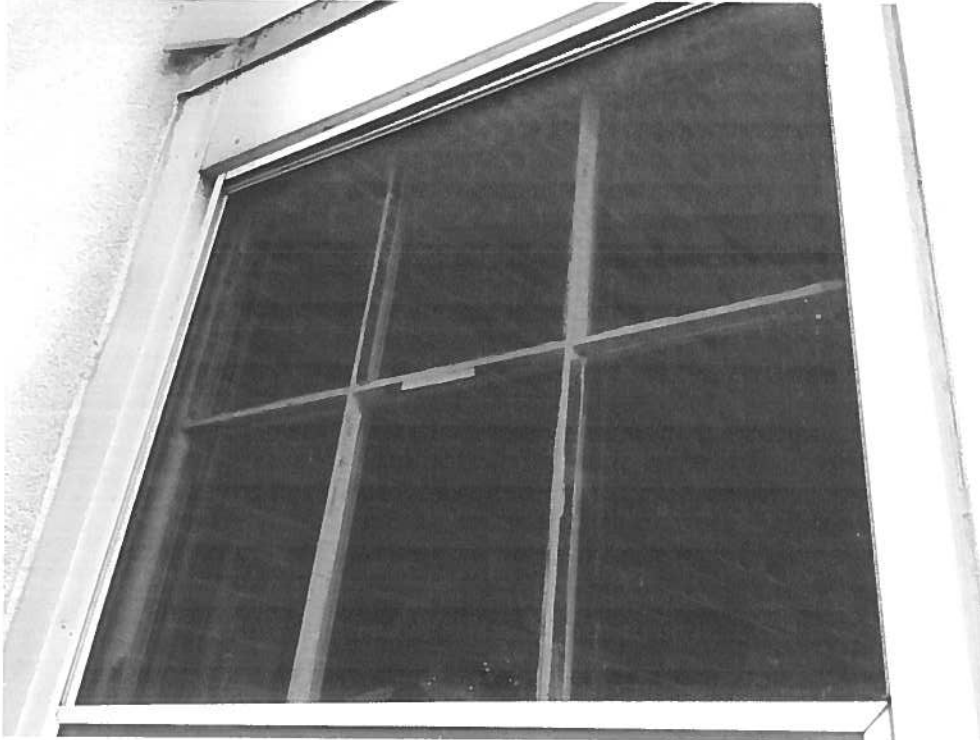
Deteriorating windows at 54 E Wall St – rear of house
